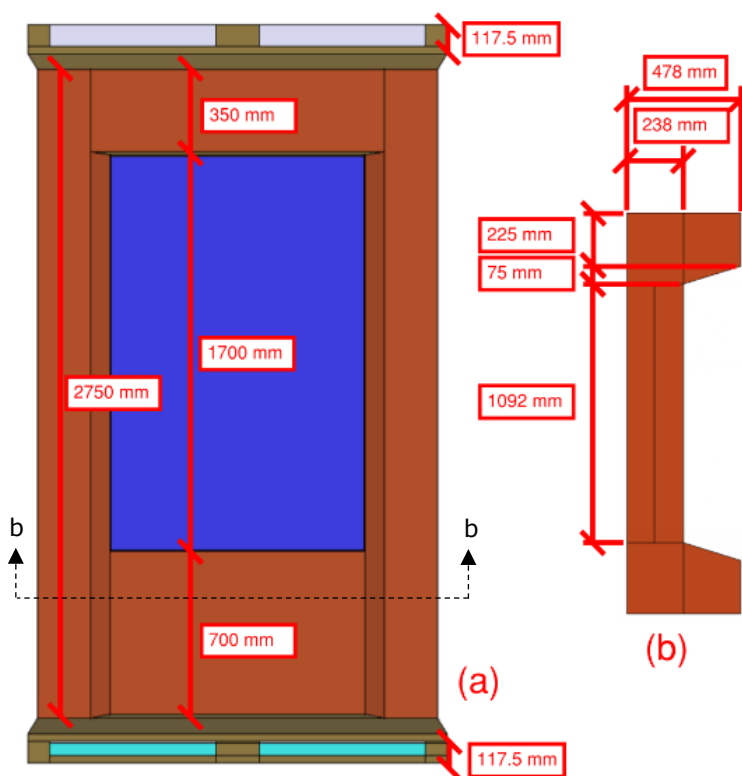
Dimensions of COMSOL model. (a) side view of 3-dimensional model, (b) horizontal cross-section through spandrel.
